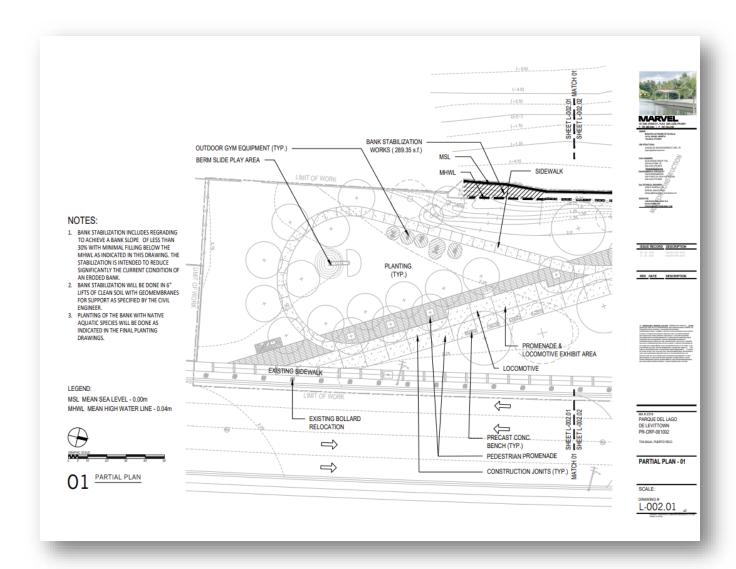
Construction plan drawing showing the wetland strip to be impacted by bank stabilization work
